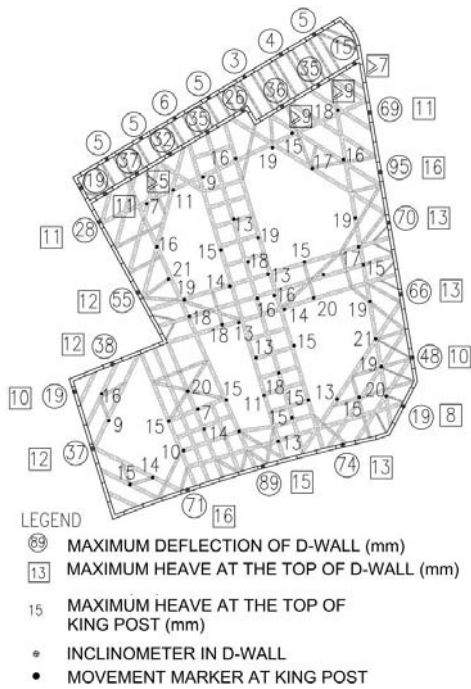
Maximum wall deflection and upward movement of diaphragm walls and king posts
